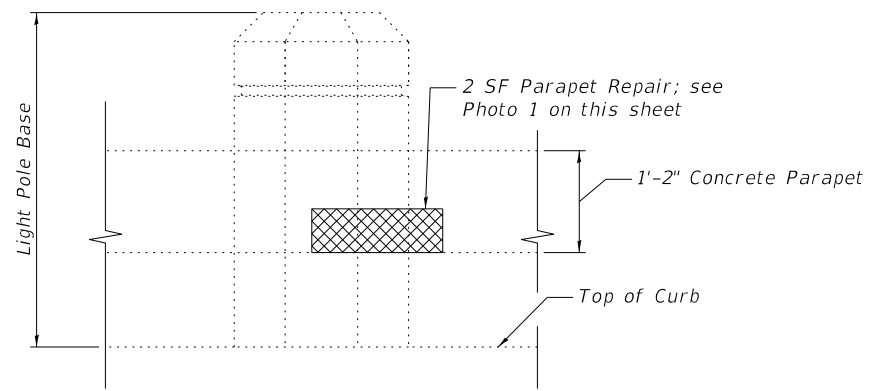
NORTH LIGHT POLE BASE
